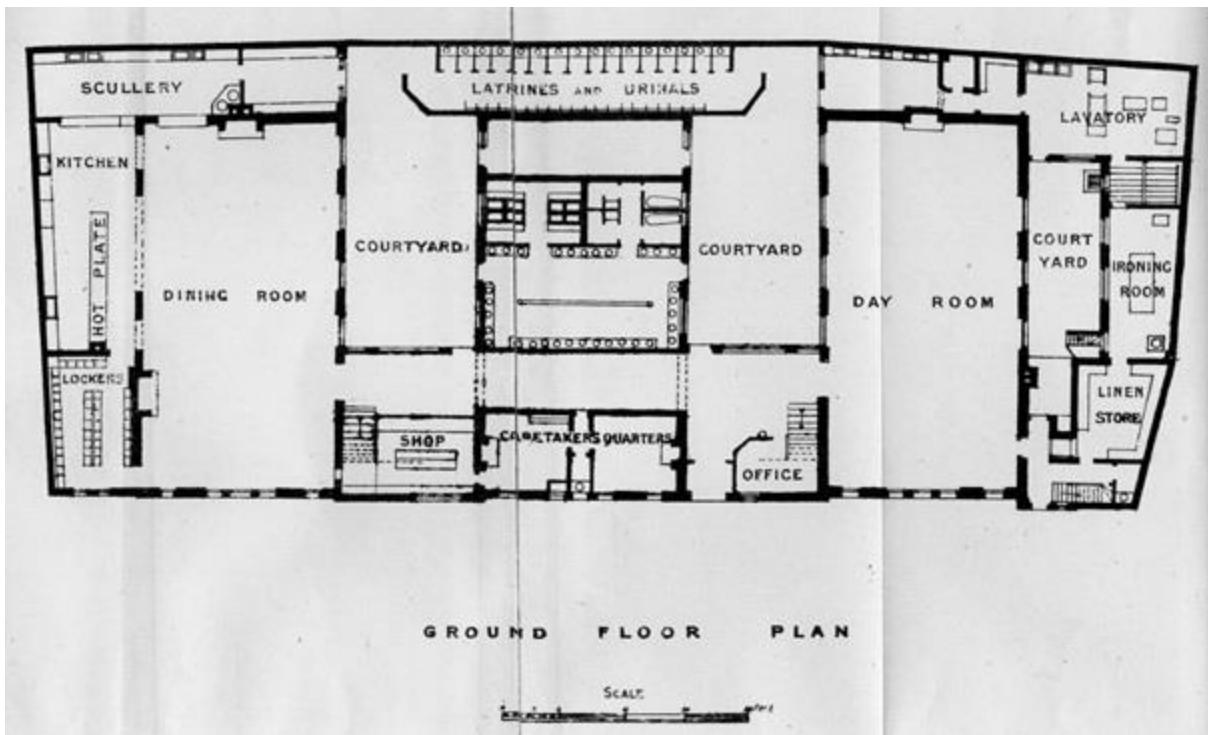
Parker Street Lodging House, ground floor (LMA ref: LCC/AR/HS/03/059)
